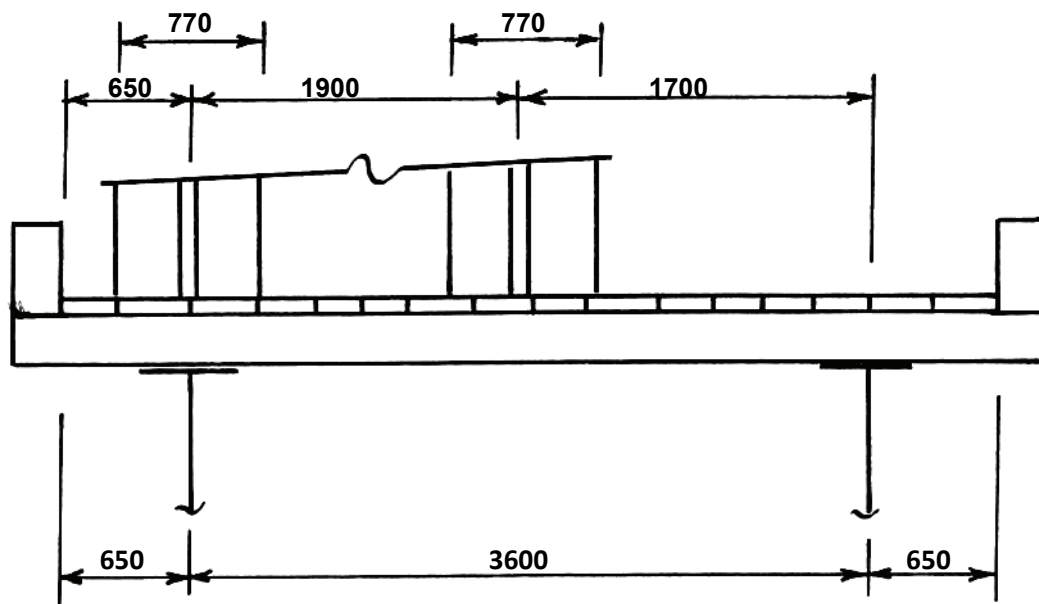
Transverse position of Light Off-highway Design Truck on timber deck on girders at a spacing of 3.6 m
